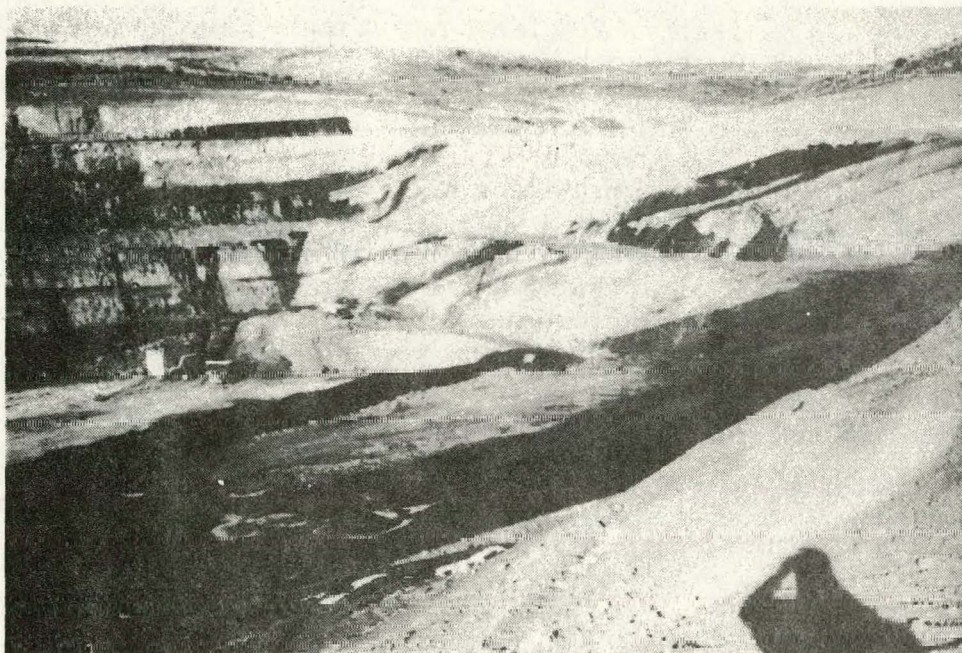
STRIPPING OVERBURDEN, LOOKING NORTHWEST
